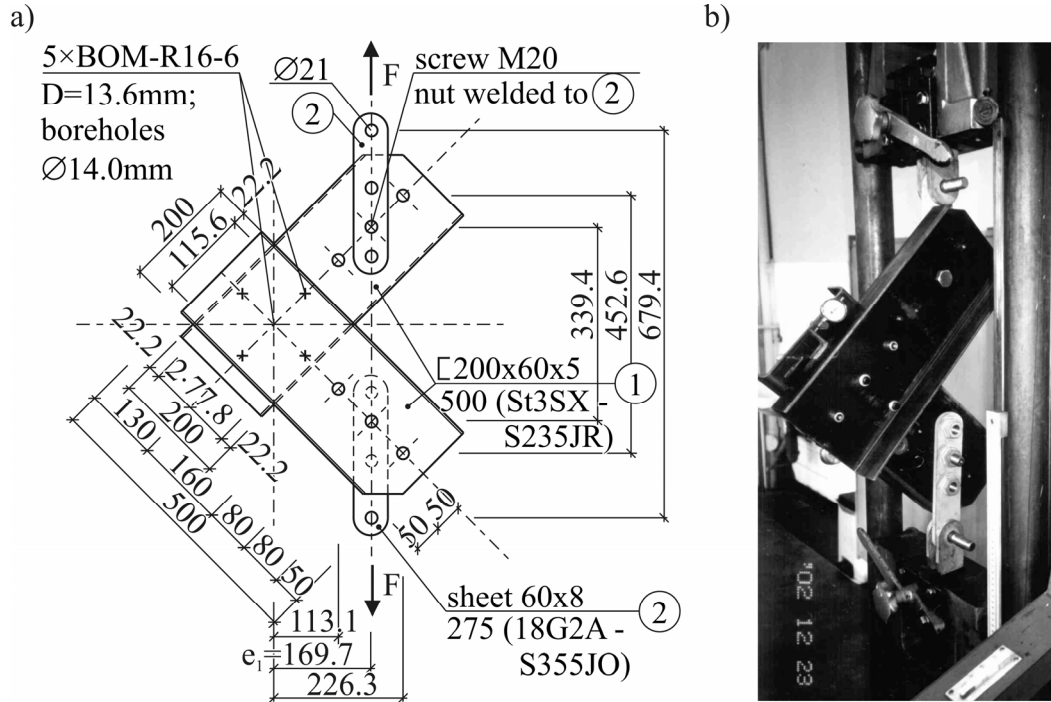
Test Element “V”: a) Dimensions, b) View of the Investigated Element, [1]
